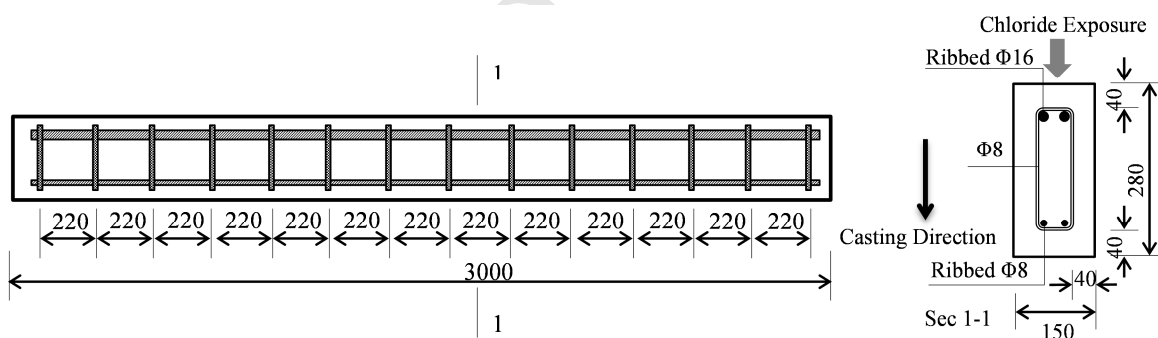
Reinforcement layout of type A beams. Dimensions are in mm
